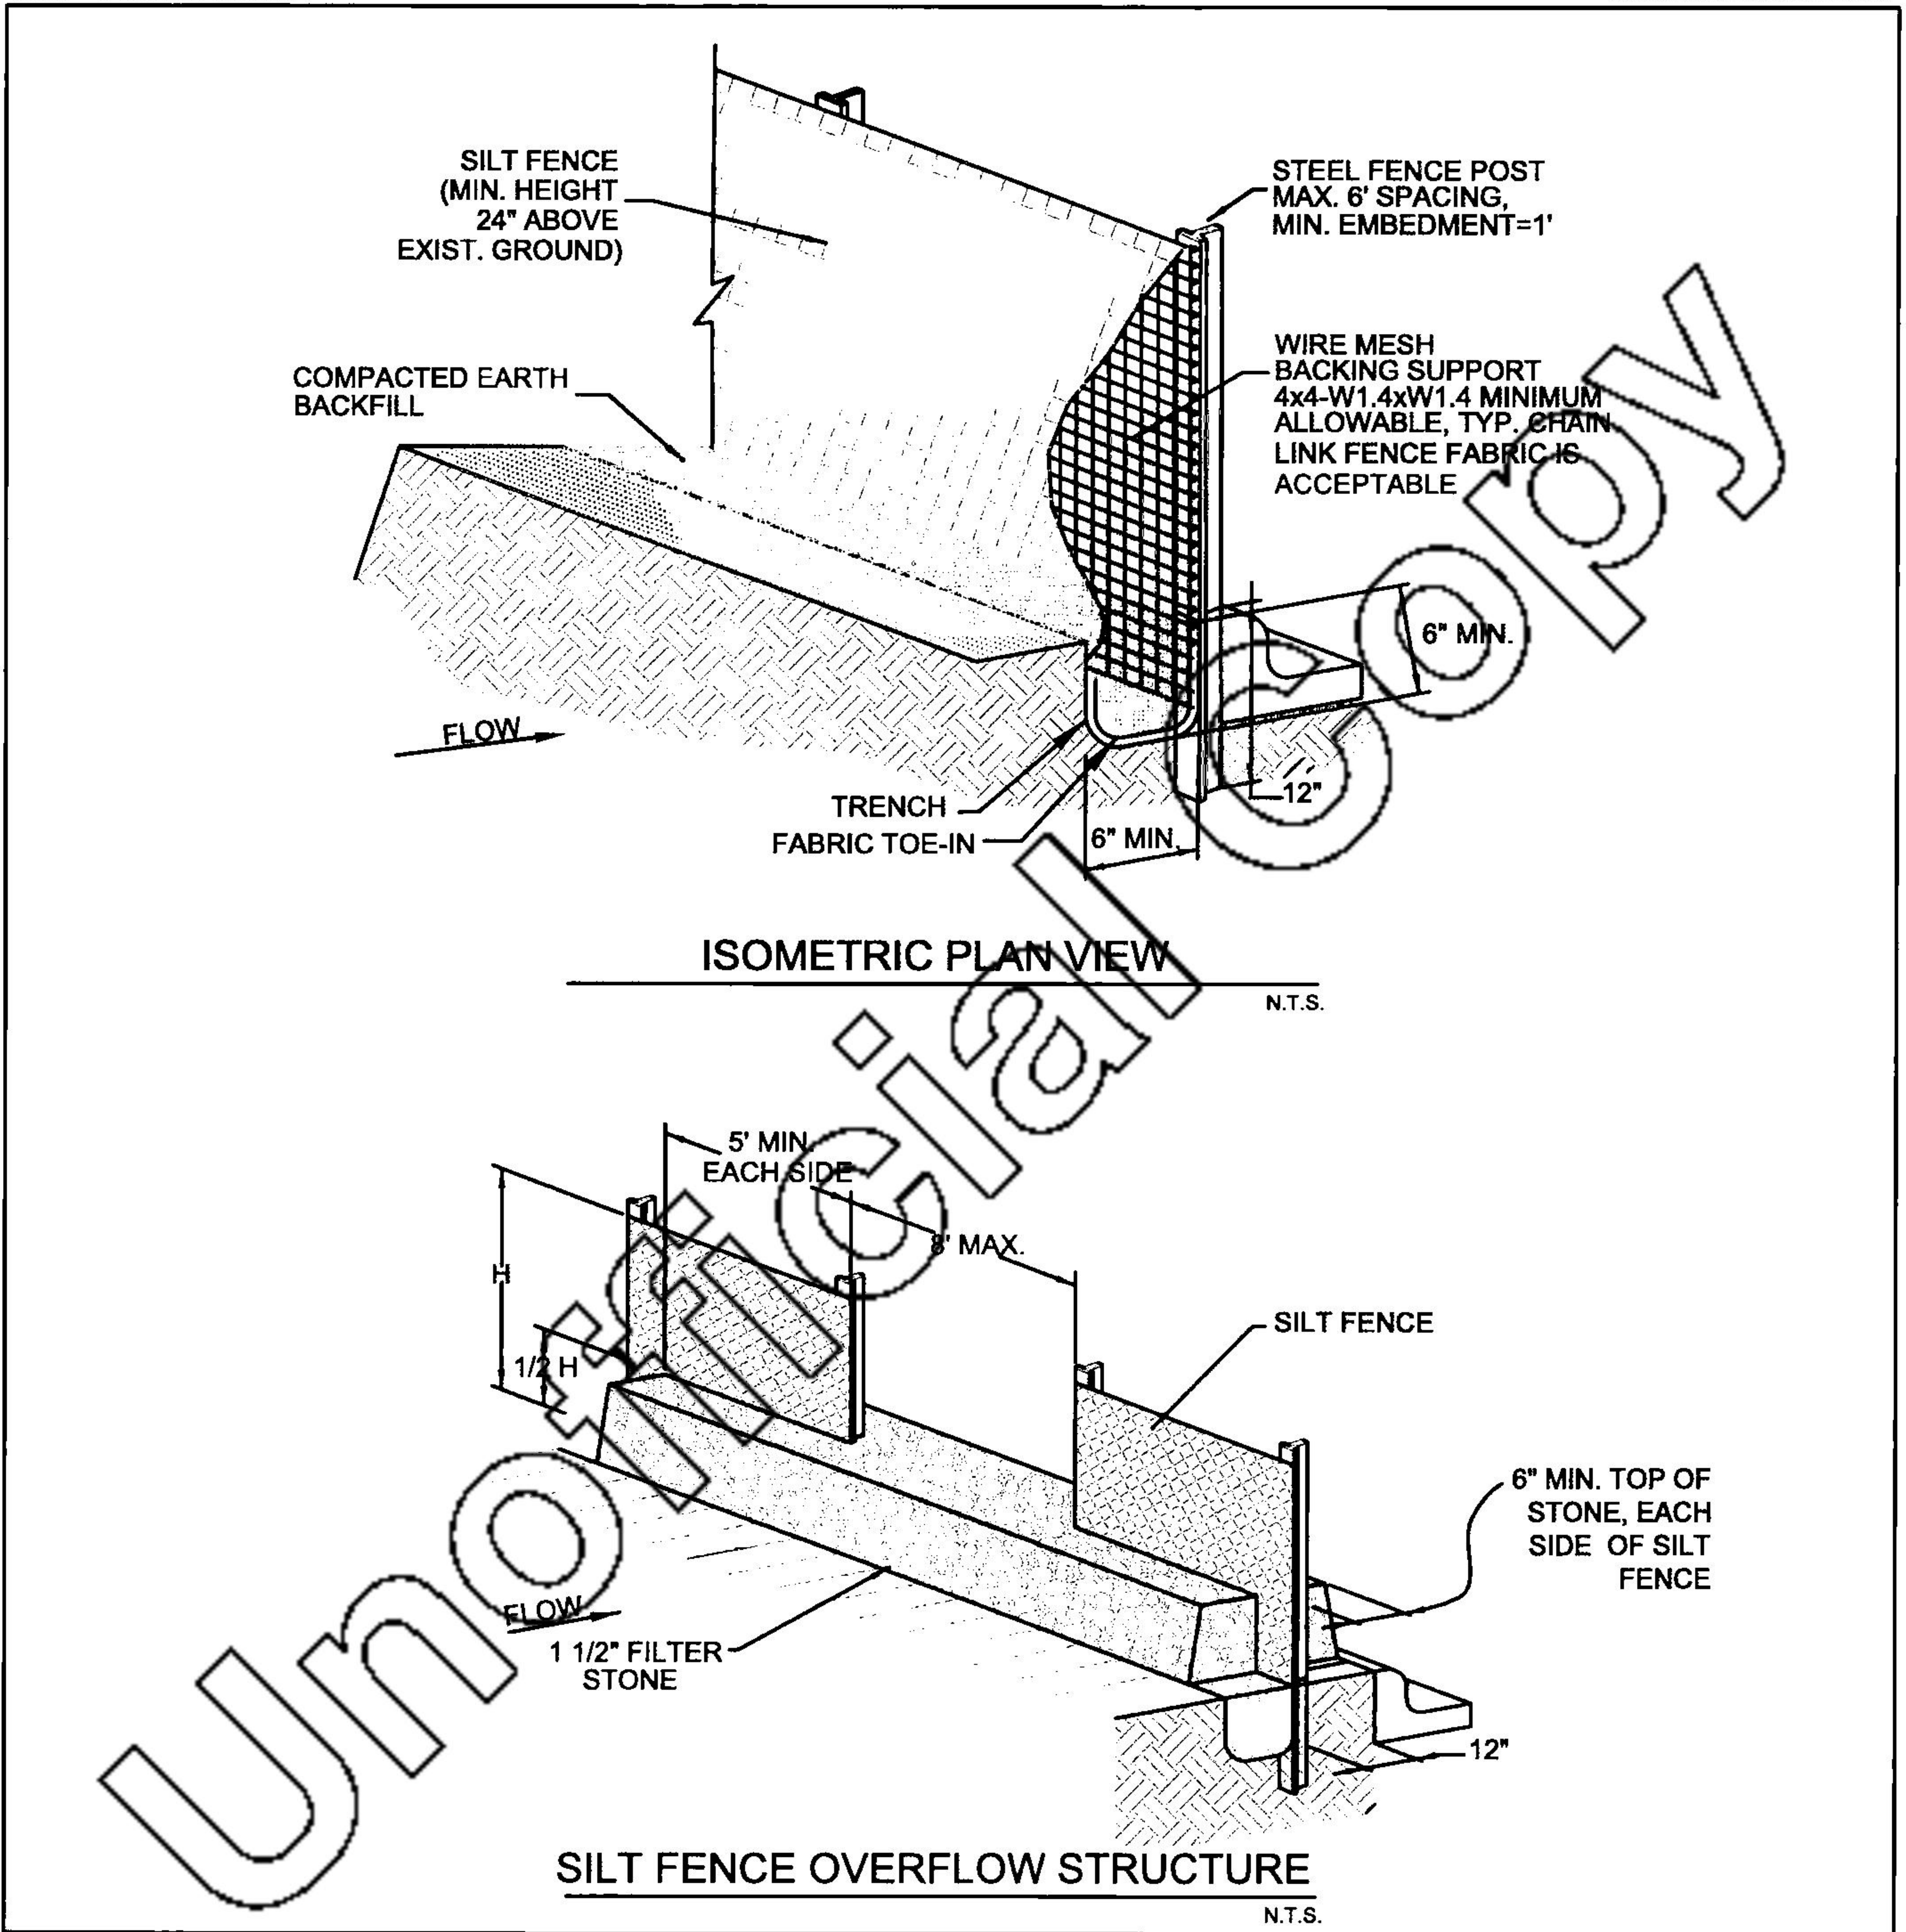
STANDARD CONSTRUCTION DETAIL - FOR SILT FENCE (1 OF 2)
